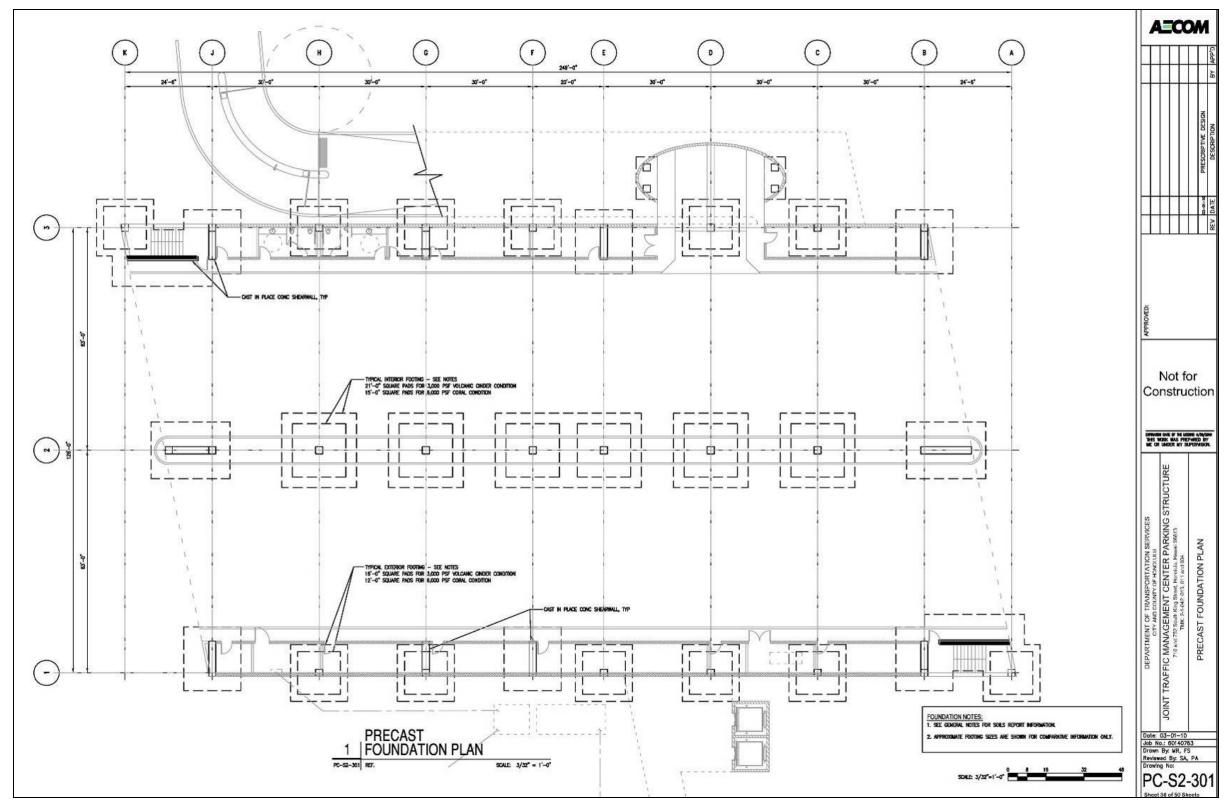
Project area plans showing the foundation plan for the pre-cast JTMC parking structure. Note that this is not a final plan therefore the layout will change slightly
